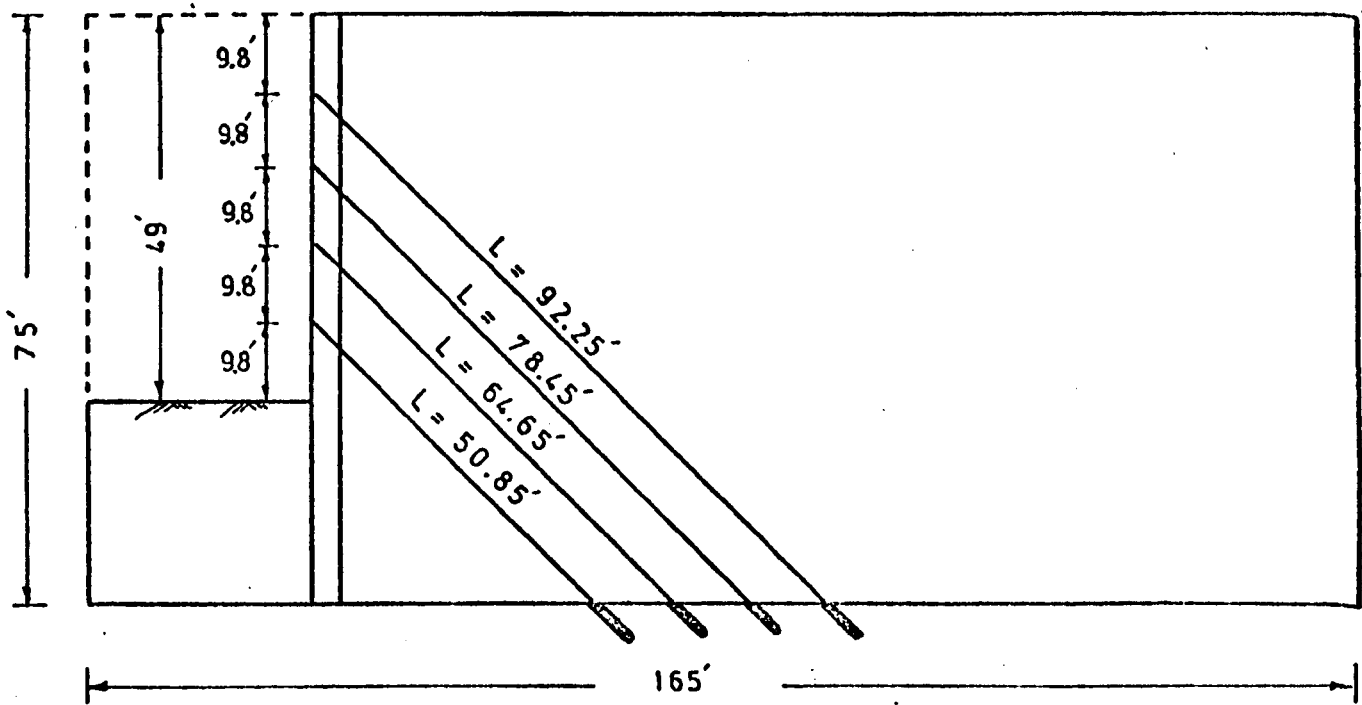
(b) A TYPICAL SECTION OF EXCAVATION II (After Clough and Tsui, 1974)
